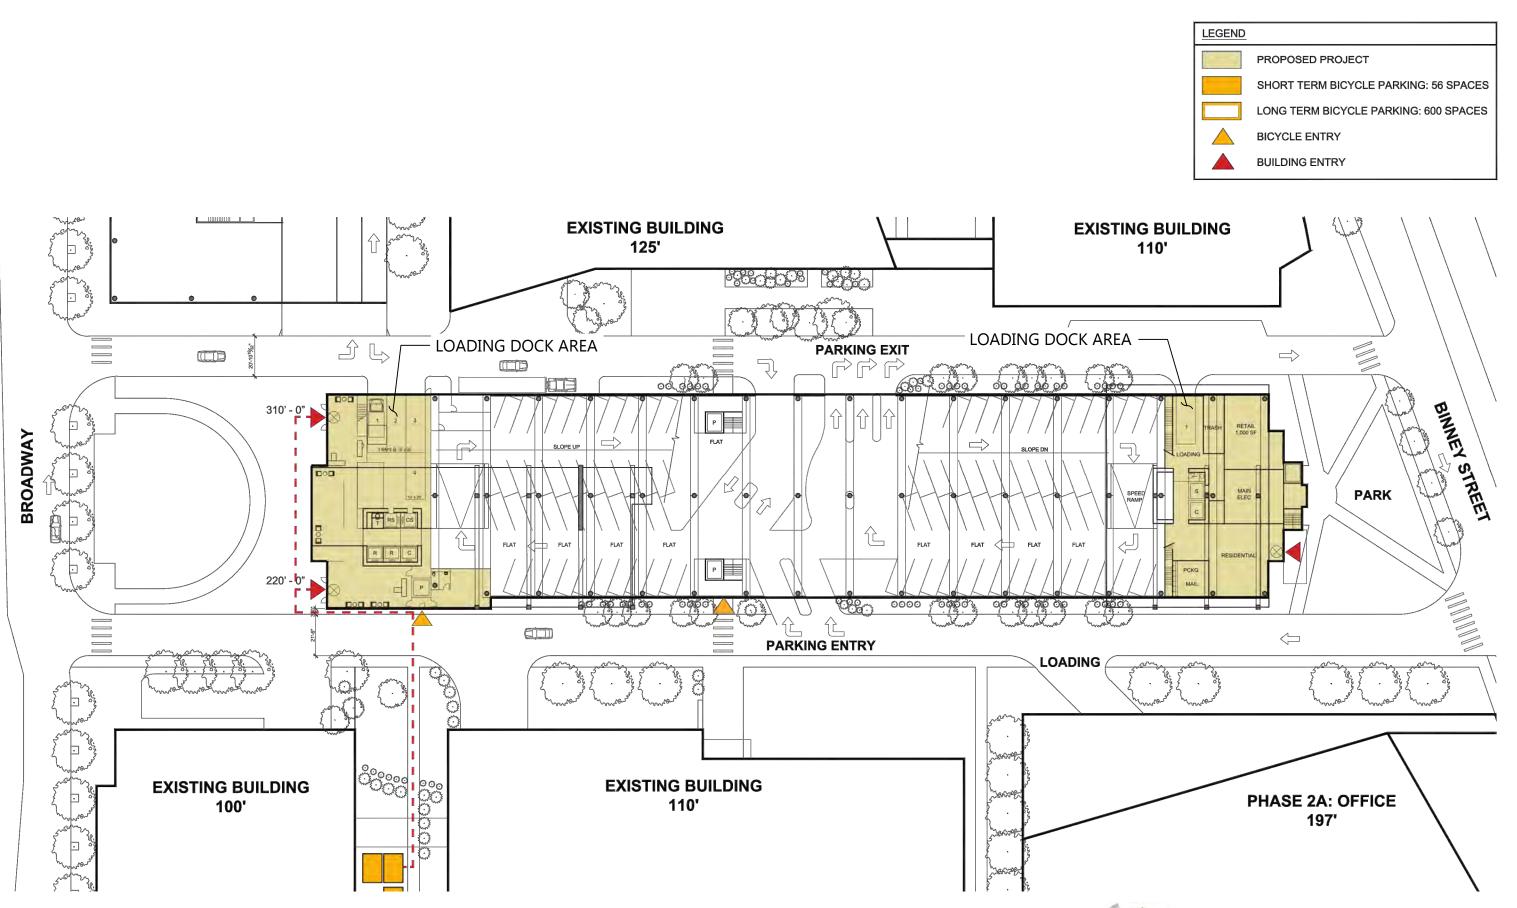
Proposed 145 Broadway Site Plan Kendall Square Urban Renewal Project Amendment No.10 Cambridge, MA
